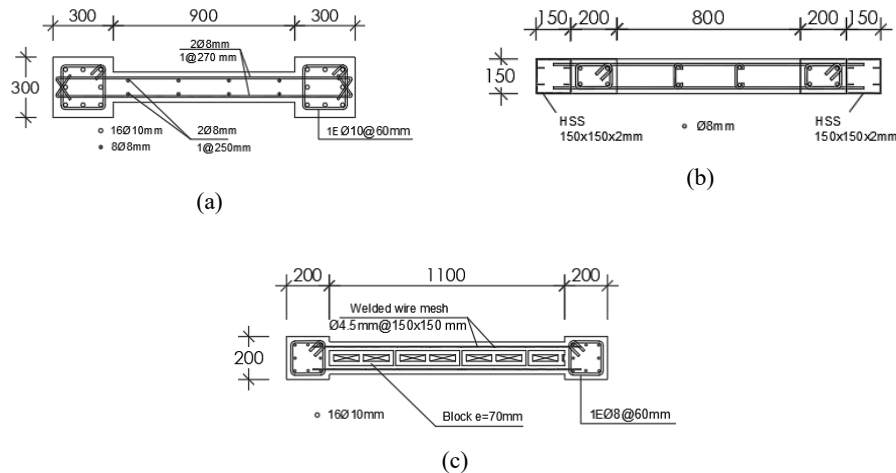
Specimens cross section details: (a) SW1, (b) SW2, (c) SW3
